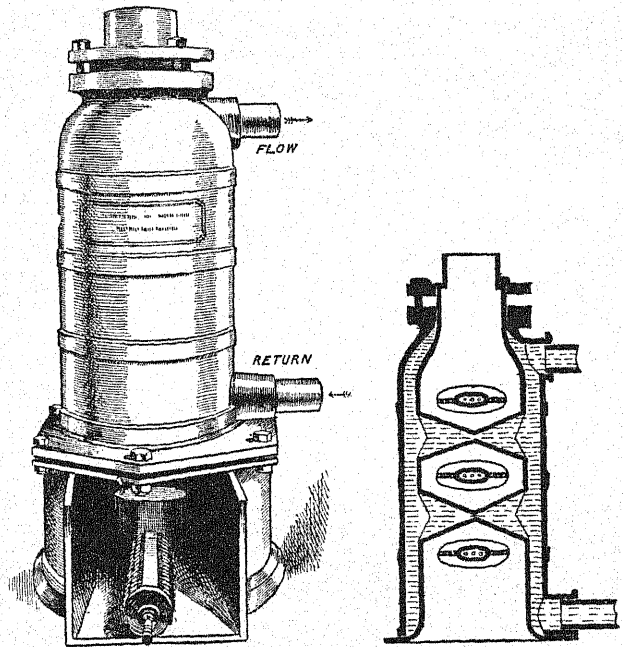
View and Section of Fletcher, Russell, & Co.'s Cross-tube Gas Boiler.
